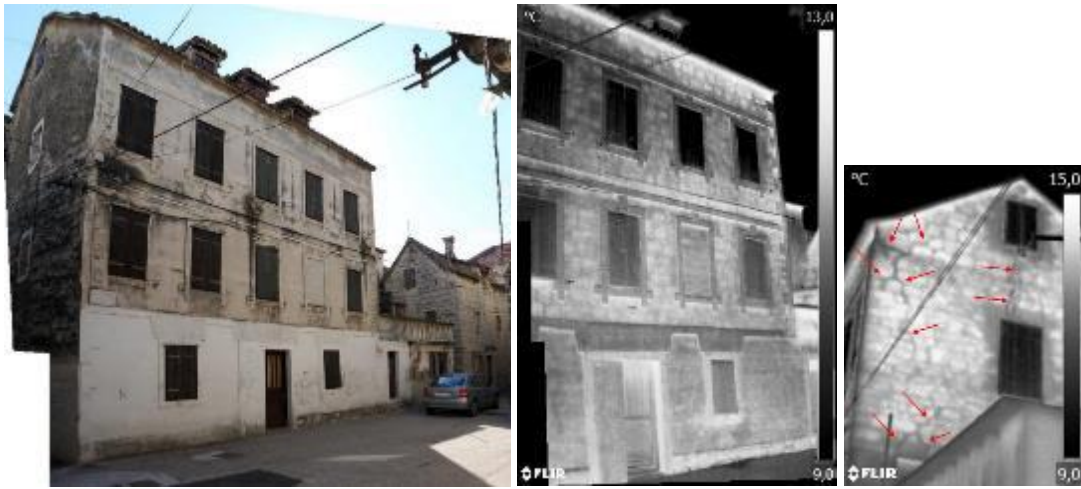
Residential building Cambijev trg 11: Unreinforced stone masonry building, the ground is made in different period from the first and the second floor, significant cracks of gable wall.
